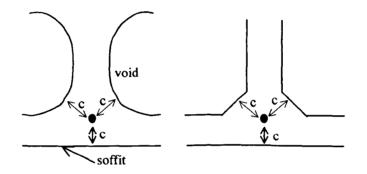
Cover to pretensioning wire in a section of a hollow core slab unit
